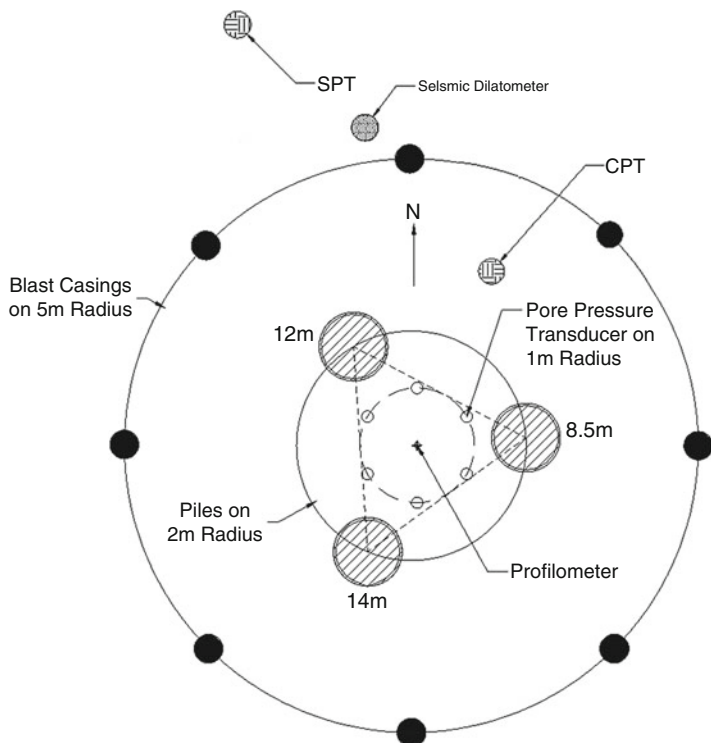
Plan view of test piles, blast holes and instrumentation
